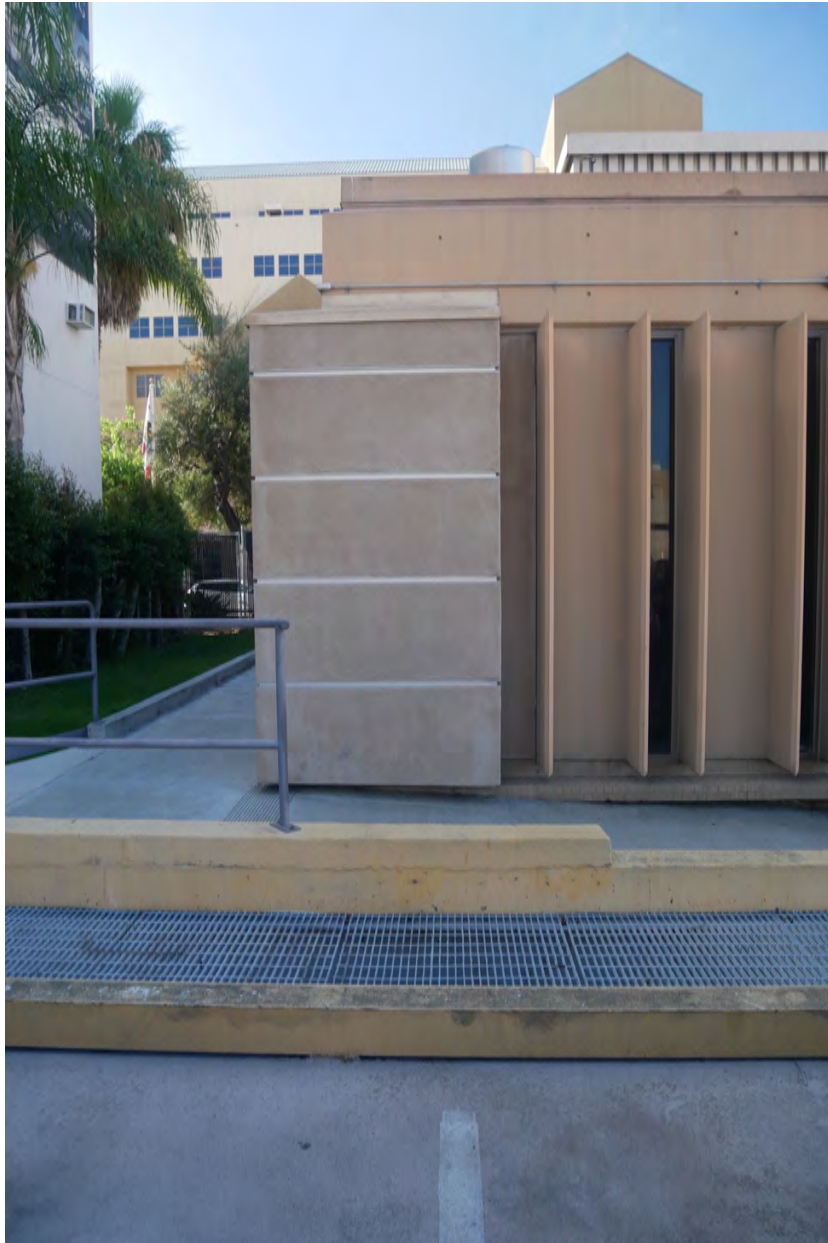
Northeast elevation. One-story east wing, with stucco infill at east end and mechanical addition on roof.
